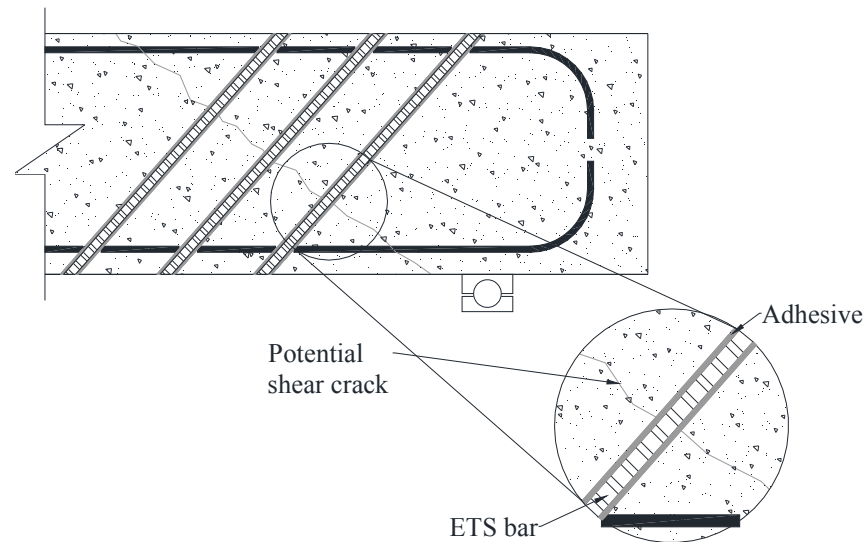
Embedded Through-Section (ETS) strengthening technique concept for the shear strengthening of reinforced concrete beams (Barros and Dalfre 2013)
